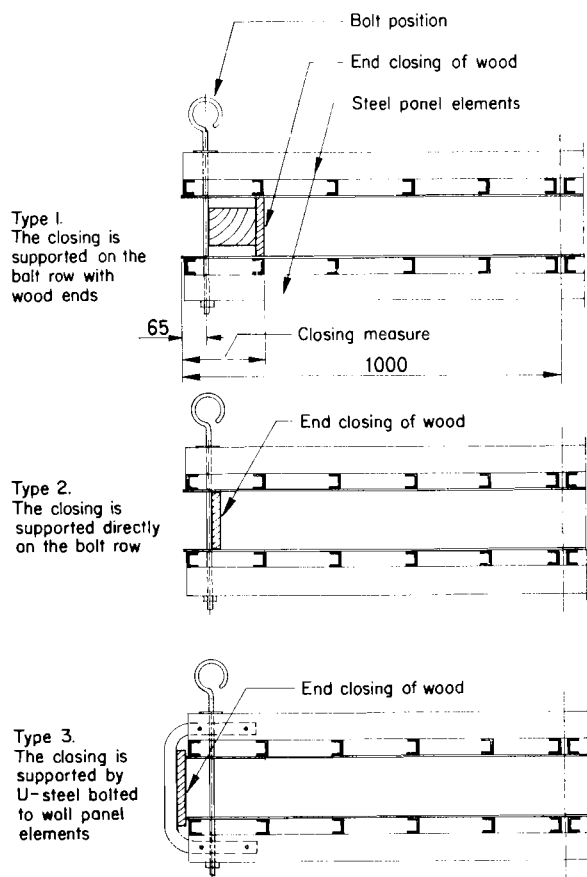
Types of end closings for wall panel elements. A table is worked out in connection with set-up drawing giving information of what types of closings are used on every wall and in cases of type 1, what closing measures to use.
